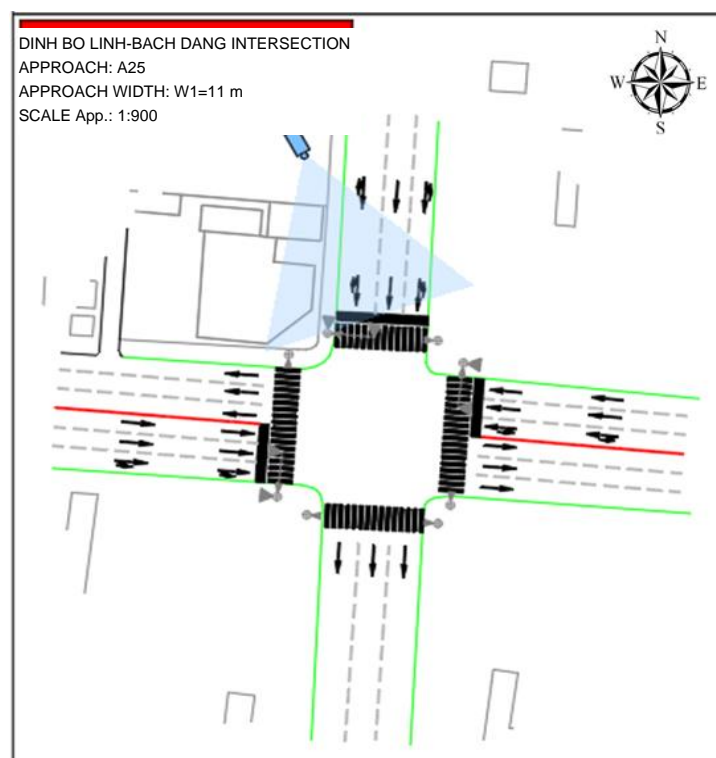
Layout of Dinh Bo Linh-Bach Dang Intersection
